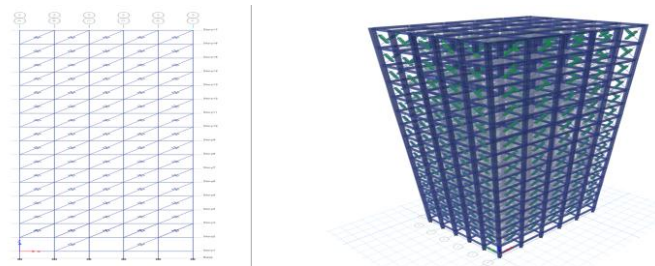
(G+15) storied building with brick infill wall and infill wall in open ground storey.
